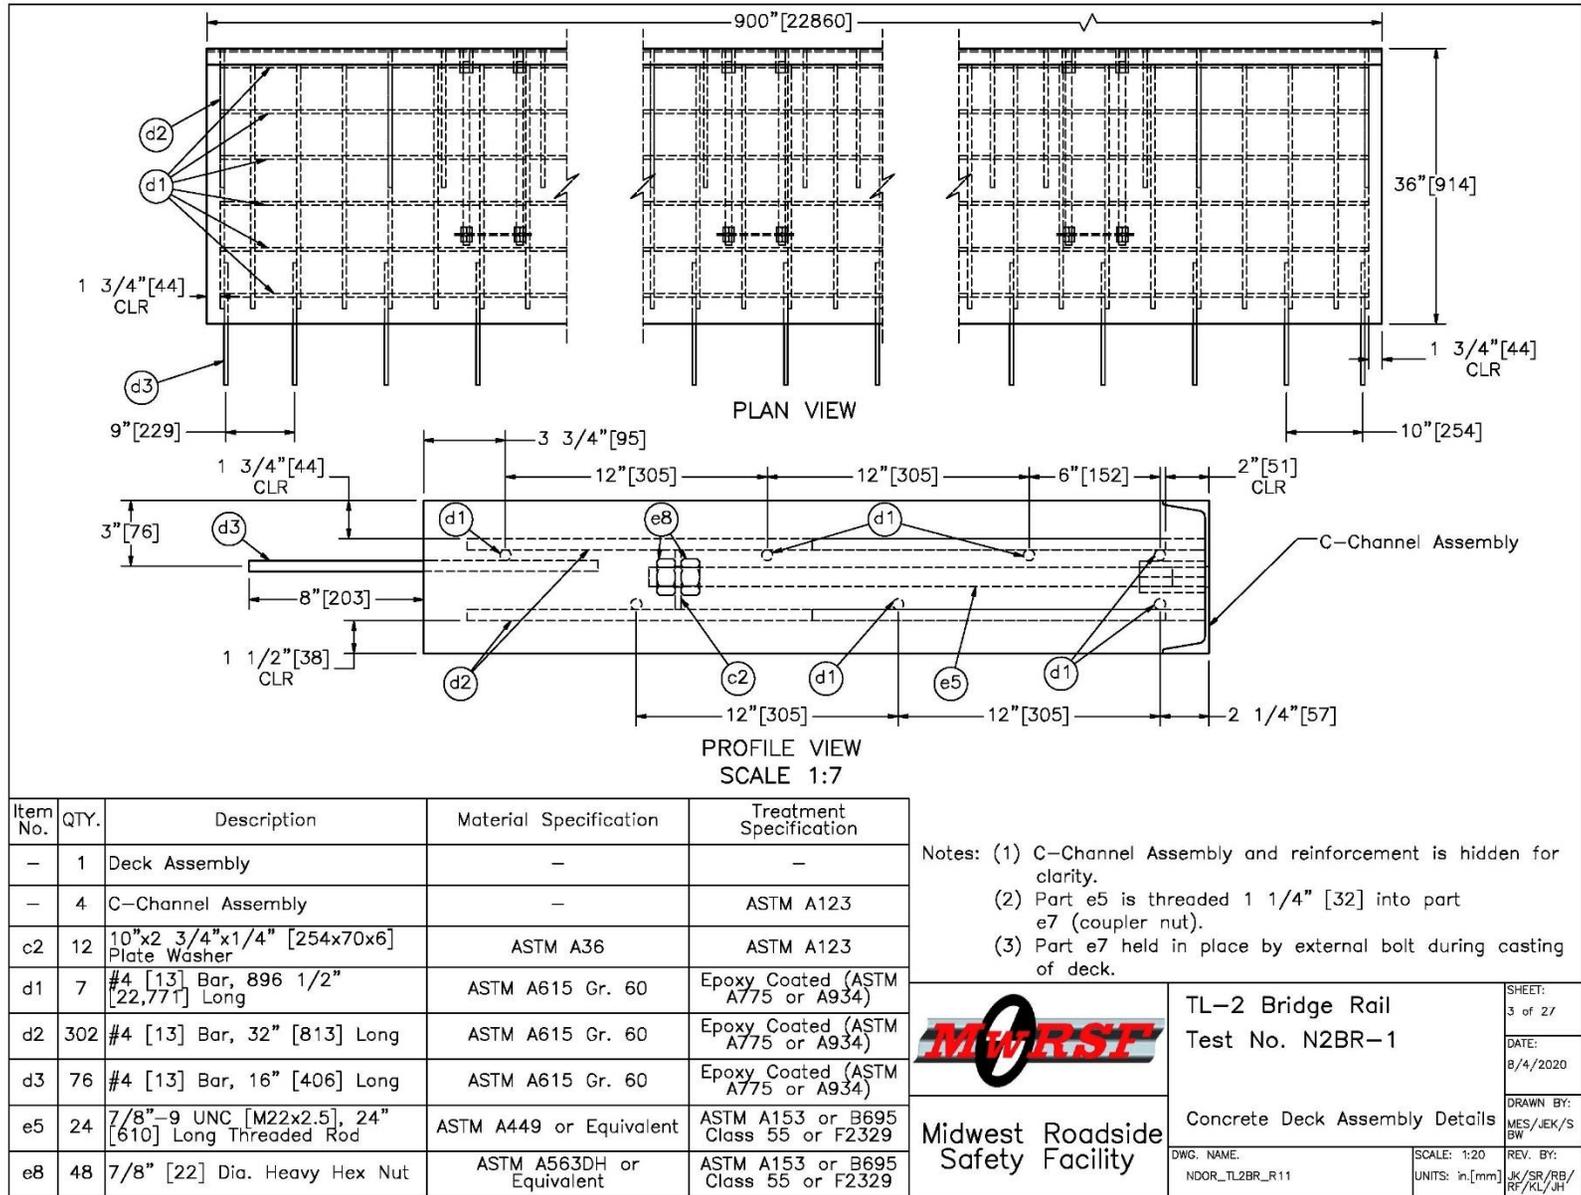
Concrete Deck Assembly Details, Test No. N2BR-1
